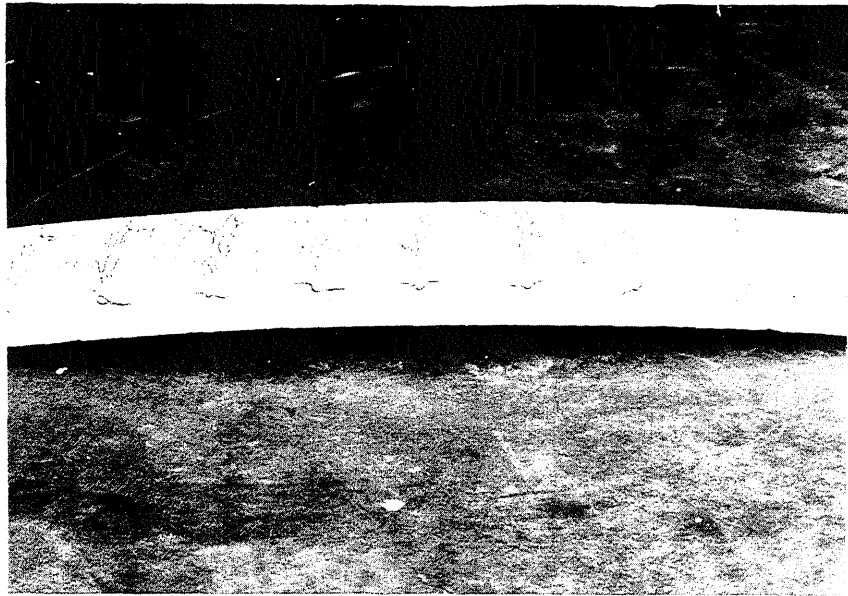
CONCRETE SLABS WITH ARTIFICIAL "PLANE OF WEAKNESS" CRACKS
